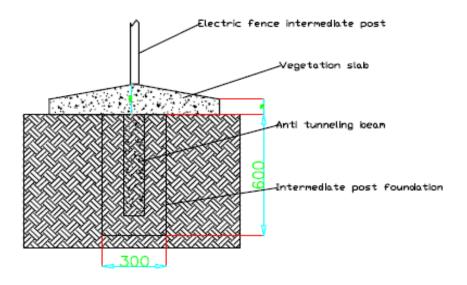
Vegetation Slab and Anti-tunnelling Beam Elevation Detail
